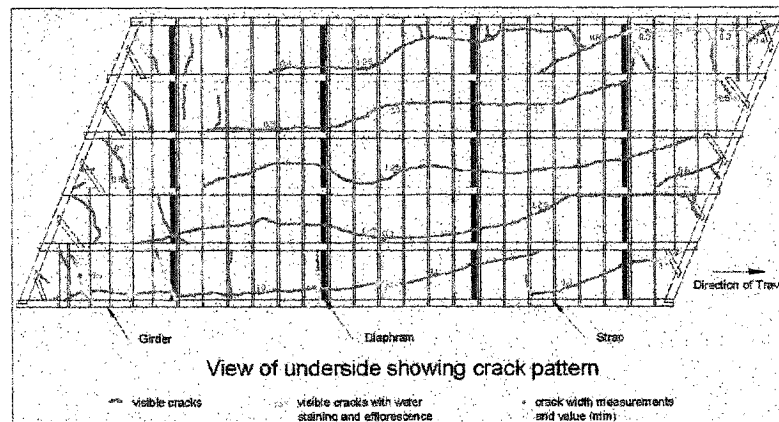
Salmon River Bridge, Soffit Crack Pattern (Mufti et al. 1999)
